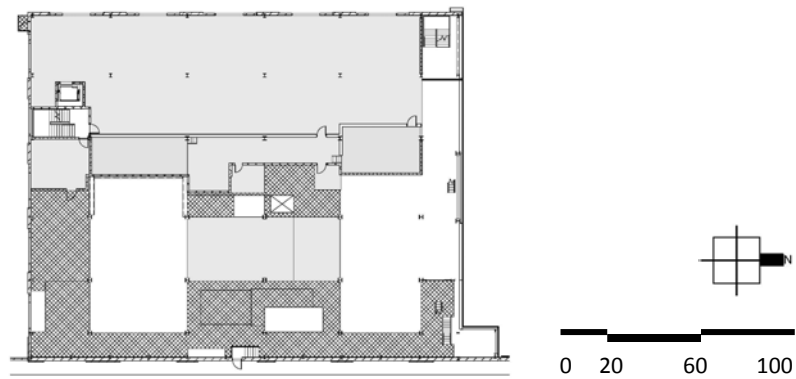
Fifth Floor Plan. Alley Poyner Macchietto Architecture, 2014.
